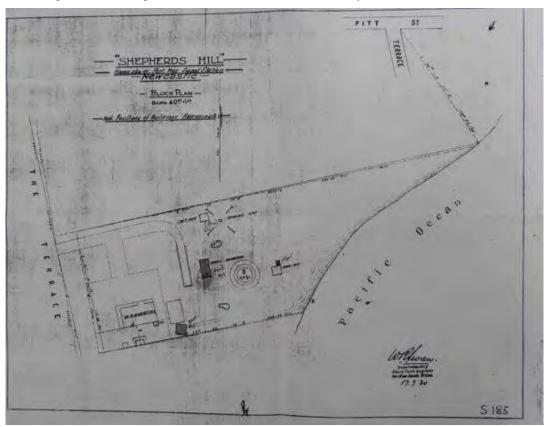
This plan of the Port War Signal Station showed the buildings on the site. (Source: NAA, SP394/1, NL23/2211, Plan S 185)
